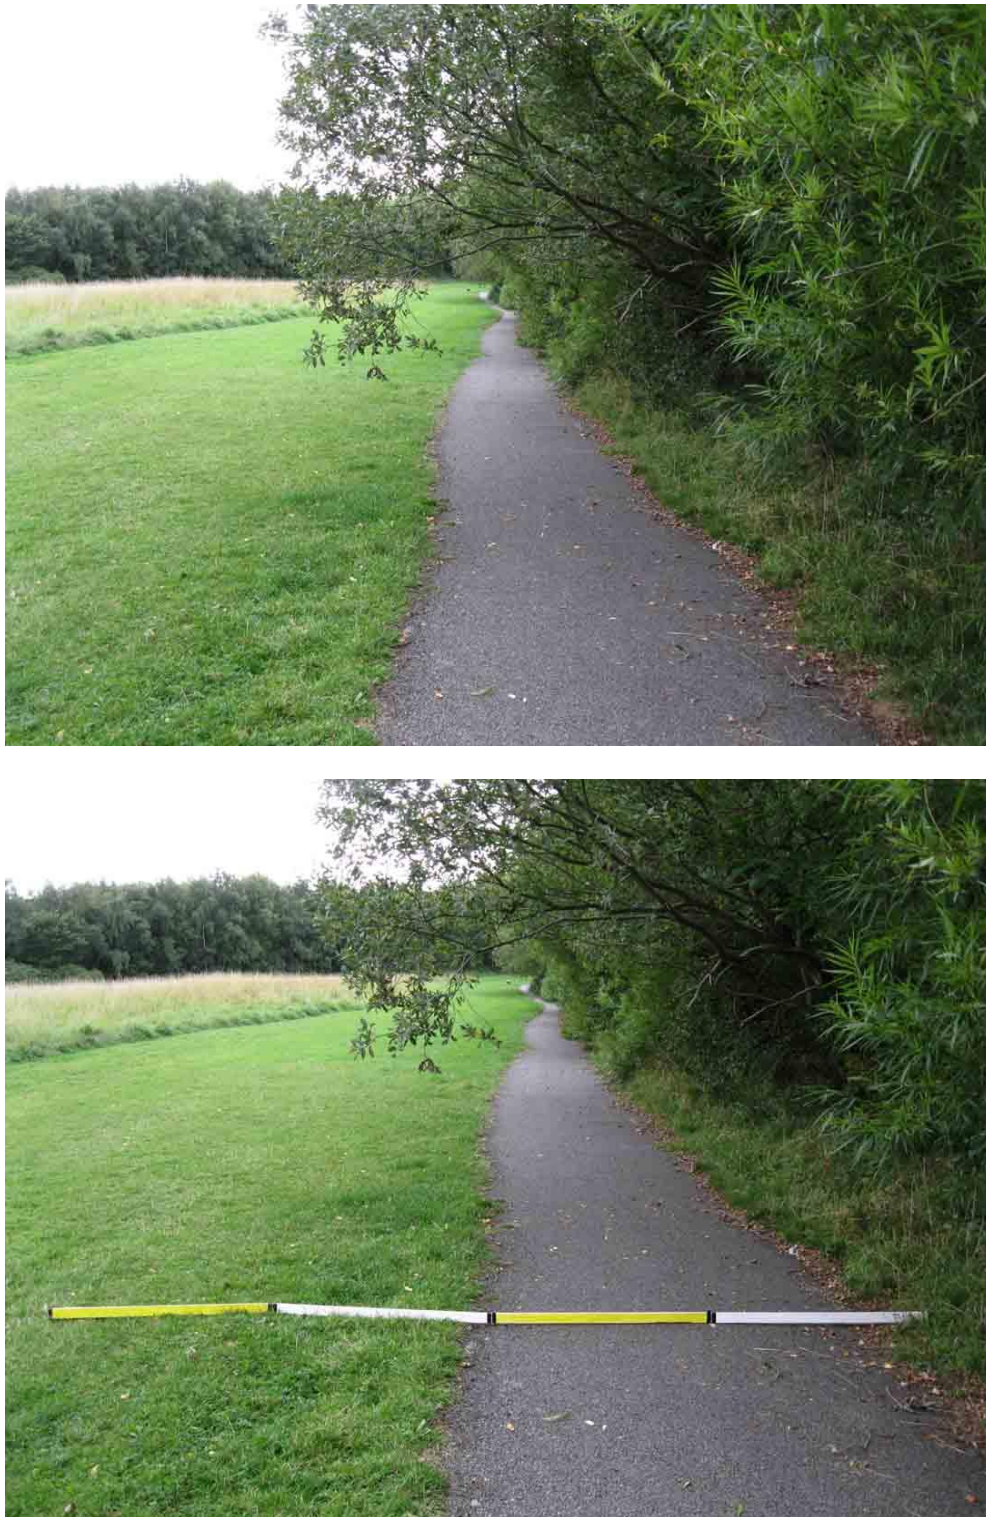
SDCC: Existing path from Kilvere Estate to Springfield Ave. road bridge
